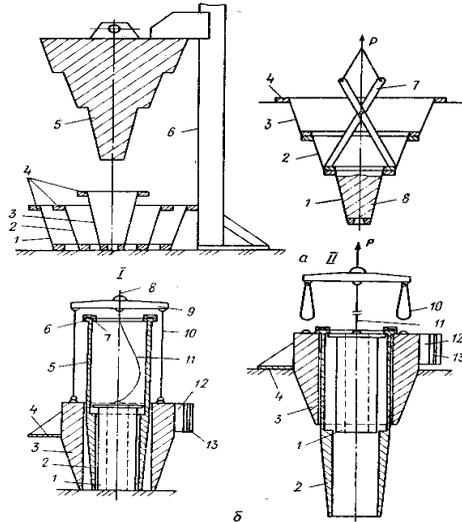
Devices for ramming recesses: *a* - with moulded casings; *b* - with multi-mass working body I - initial state; II - removal of the working body
